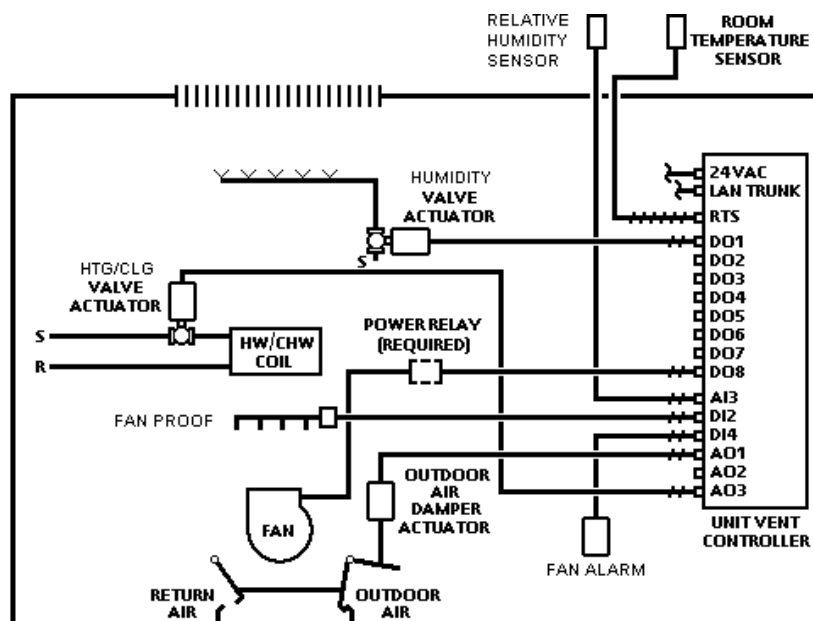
Application 2306 Control Drawing with 2-Pipe Coil, Modulating Damper, and 2-Position Humidifier.
